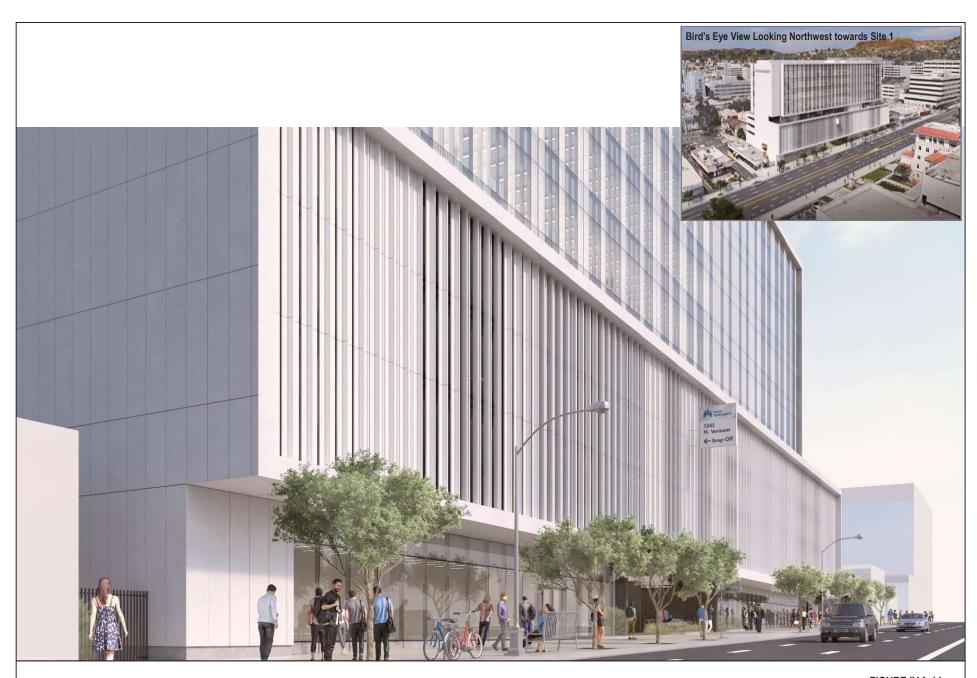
Renderings of Proposed Project Design: Site 1 Development
